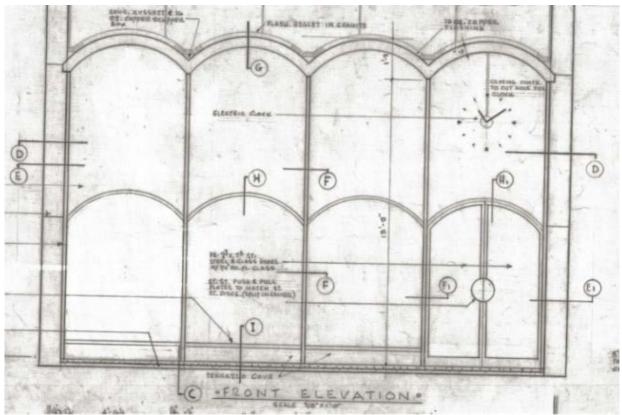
Original drawing by architect Lee Casaccio, Alterations Colonial Federal Savings and Loan, Sheet 3 - Front Elevation and Details, 1962, courtesy of Lee Casaccio, Jr.
